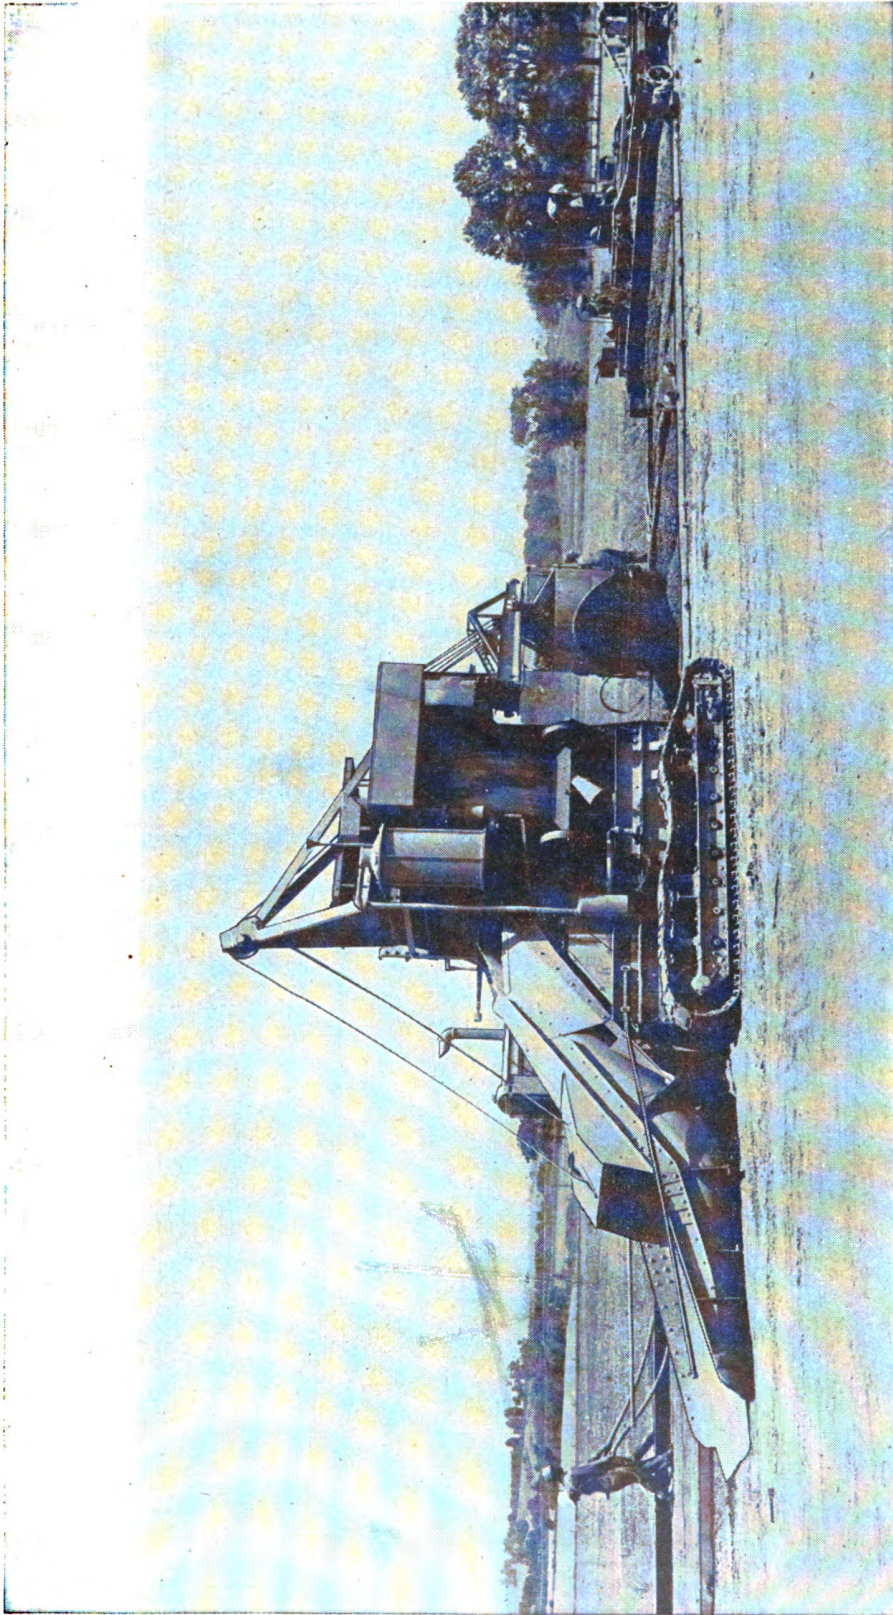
Paver, concrete, crawler-mounted, 34-cubic foot.
